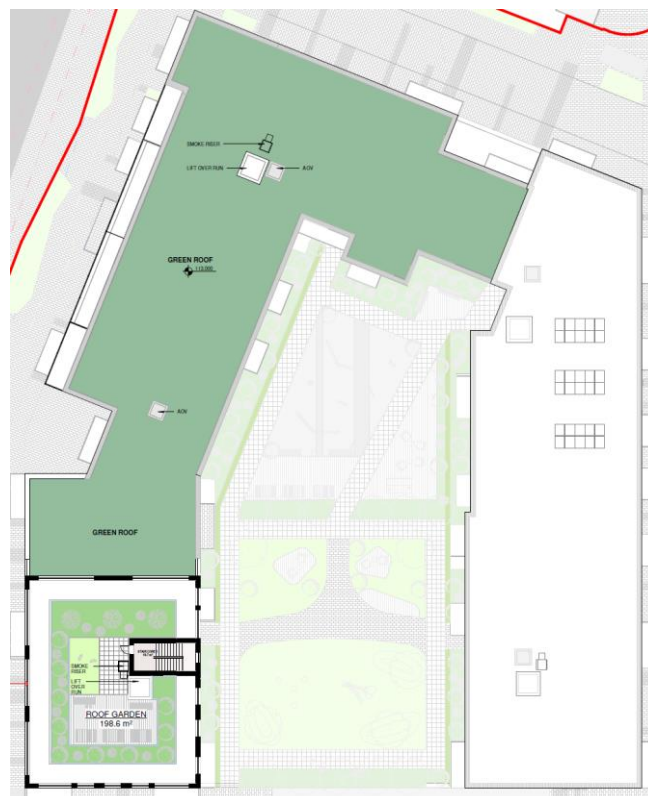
Eighth floor plan. We note the provision of a roof garden at this level and green roof/solar panels atop the various blocks.
